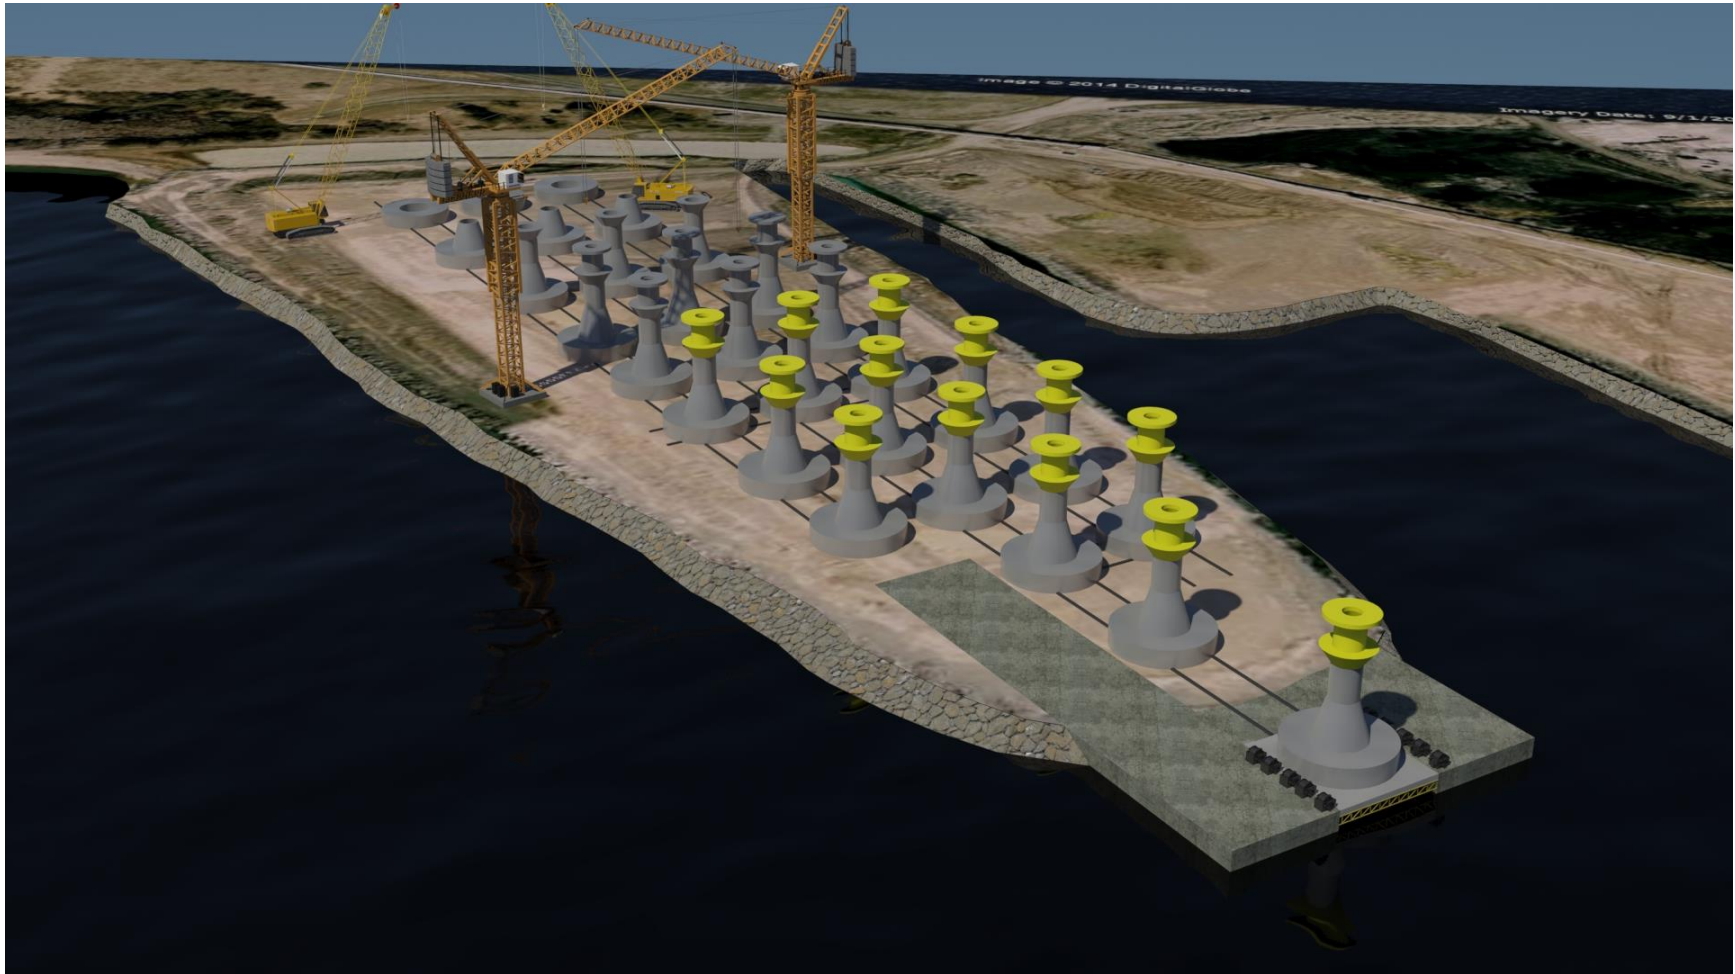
Fabrication Facility Layout with Foundation on Elevator
